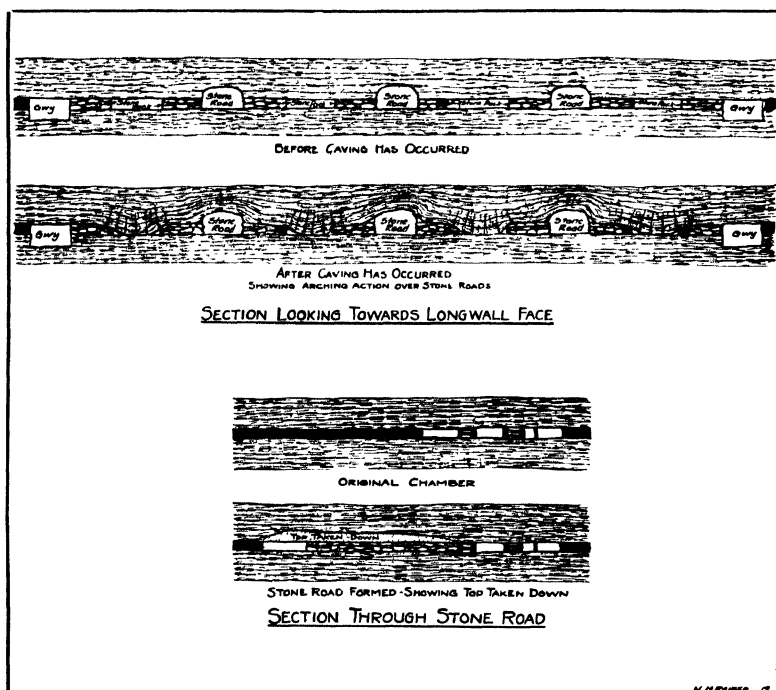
(b).—LONGWALL WITH ROCK-PACKED ROADS.
